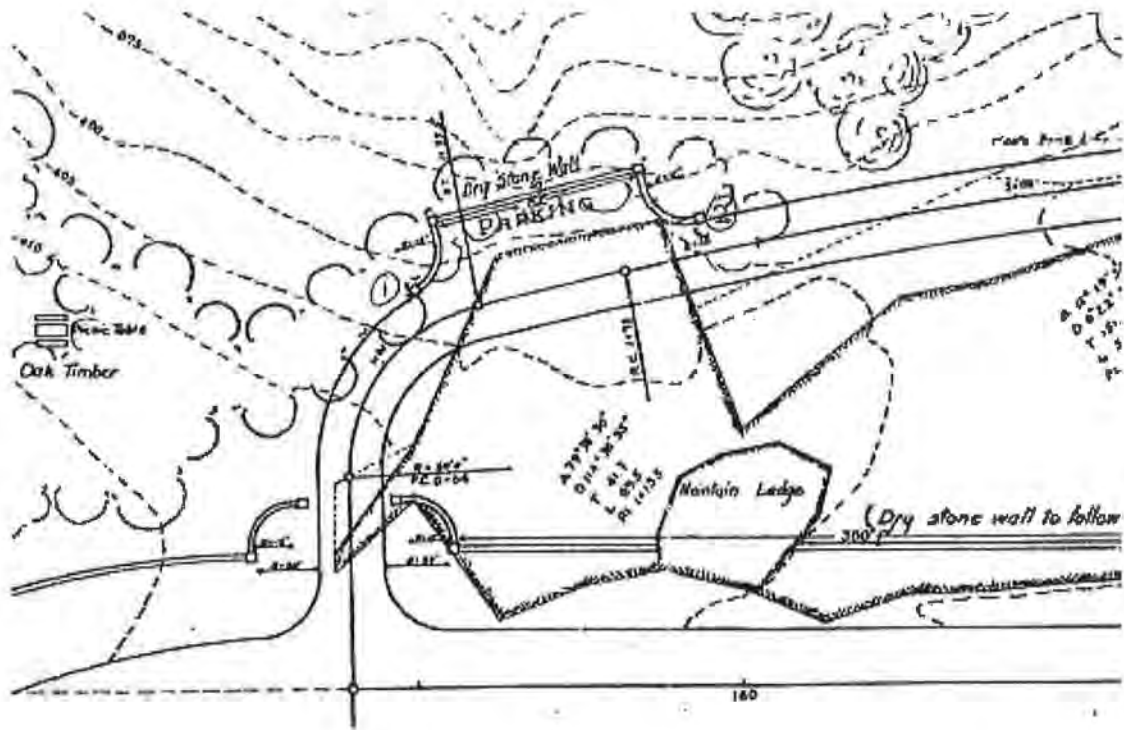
Detail from the original plans, drawn April 1934, showing the South Wall and Gateway, Parking Bay, and the east edge of the West Picnic Area. Note the way the South Wall was originally intended to incorporate a rock outcrop east of the entrance. This strategy was changed during construction and the wall redesigned to skirt the south end of the outcrop instead. (Construction Plans, MHD; Site Development Unit, MnDOT, St. Paul.)
